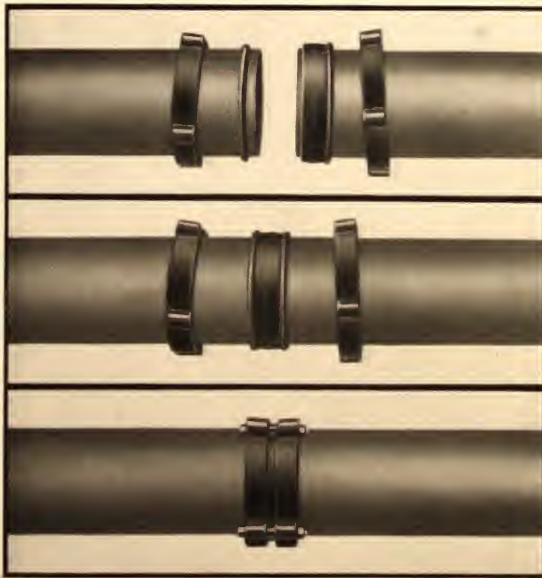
ASSEMBLY OF GIBAUT JOINT
